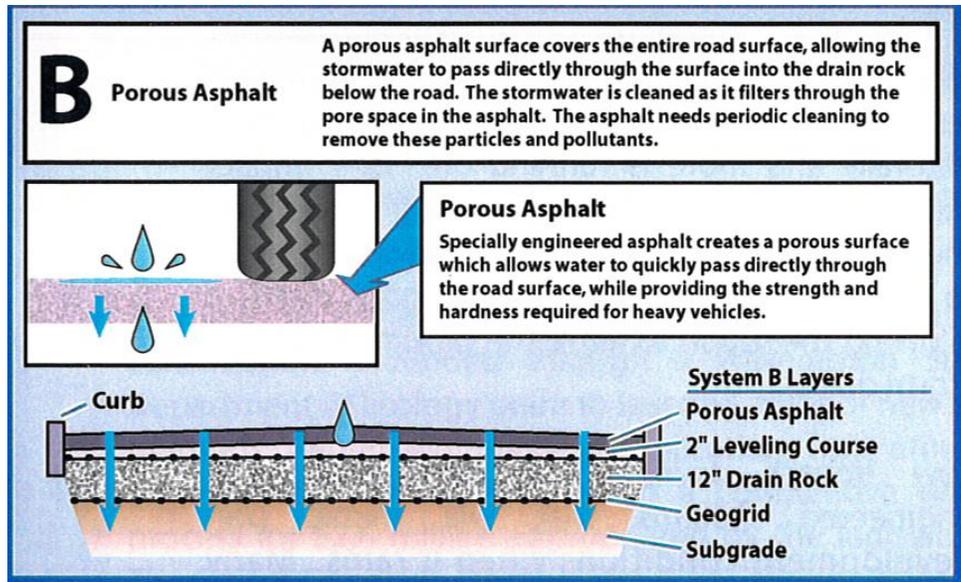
Design details of the permeable asphalt pavement on constructed in 2007 on Decatur street. Section A is a regular asphalt pavement with cartridge filter for treatment and under the road infiltration. Section C is a regular asphalt pavement with rain garden for treatment and under the road infiltration. (City of Olympia)
